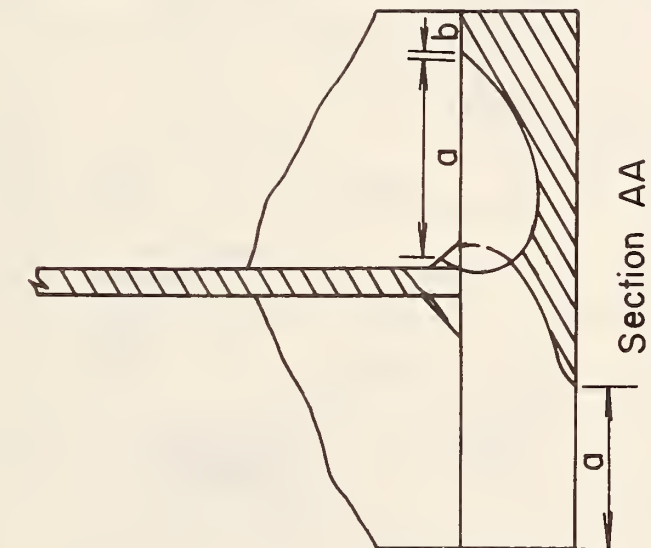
Fatigue and Fracture Surface, B11 (A588)
